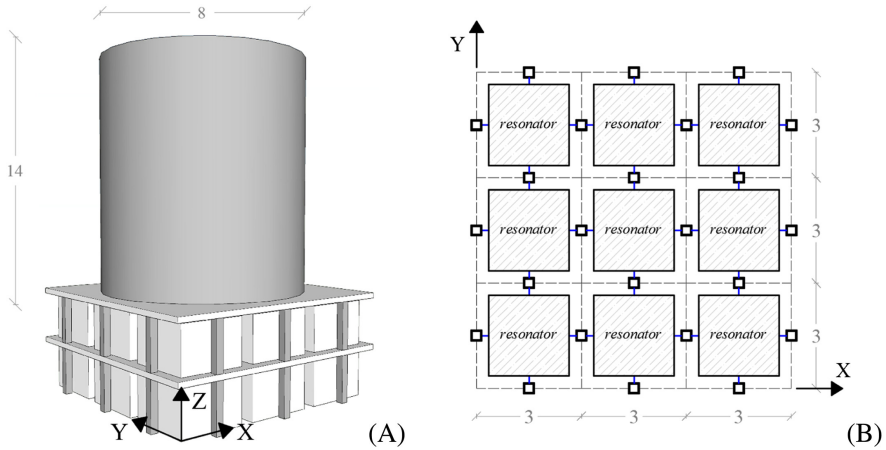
Foundation-slender tank coupled system: (A) isometric view with steel columns; (B) plan view. Dimensions in m.
